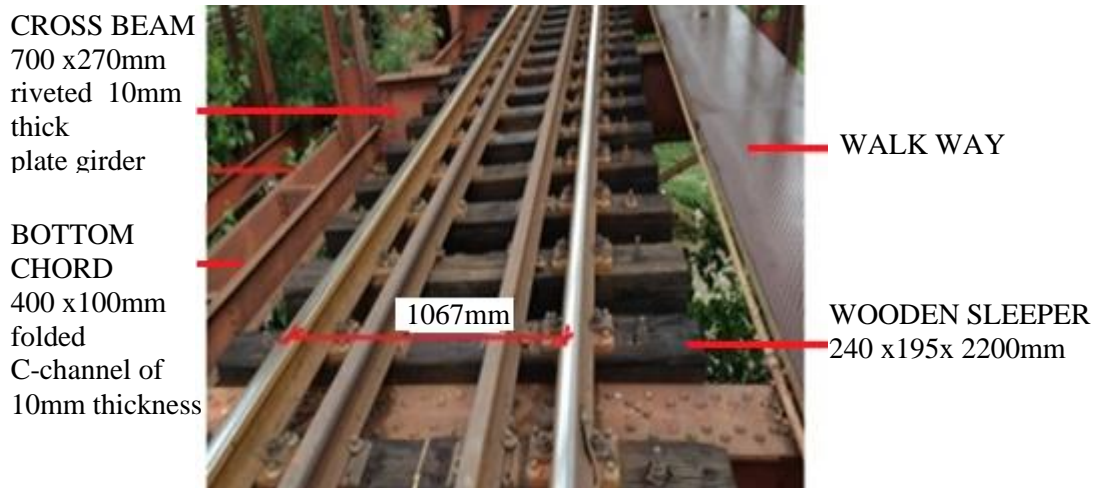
Section of bridge showing sleeper, cross beam, bottom chord and walkway
